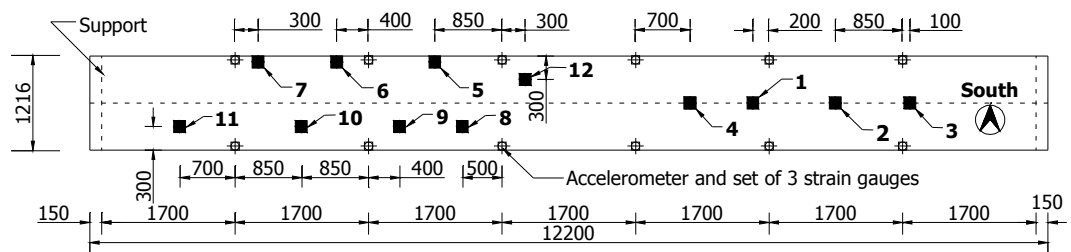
Schematic plan of girder showing locations of damage and sensors (dimensions in mm).
